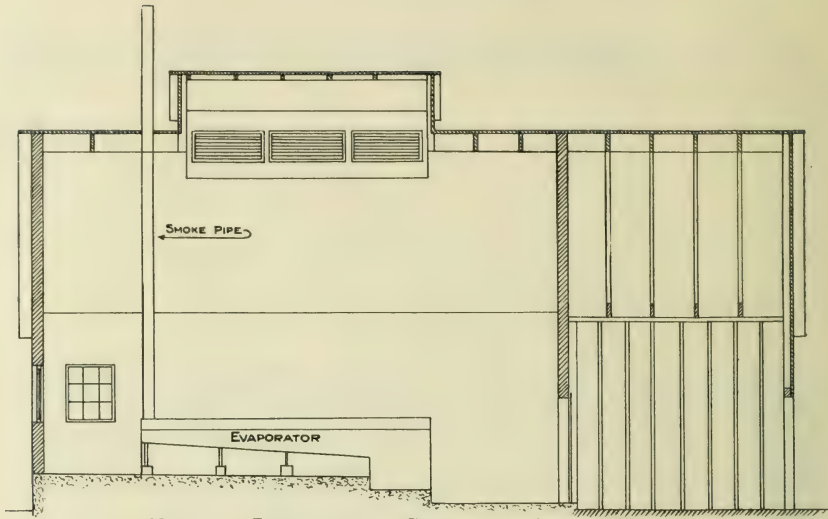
LONGITUDINAL SECTION OF SUGAR HOUSE
